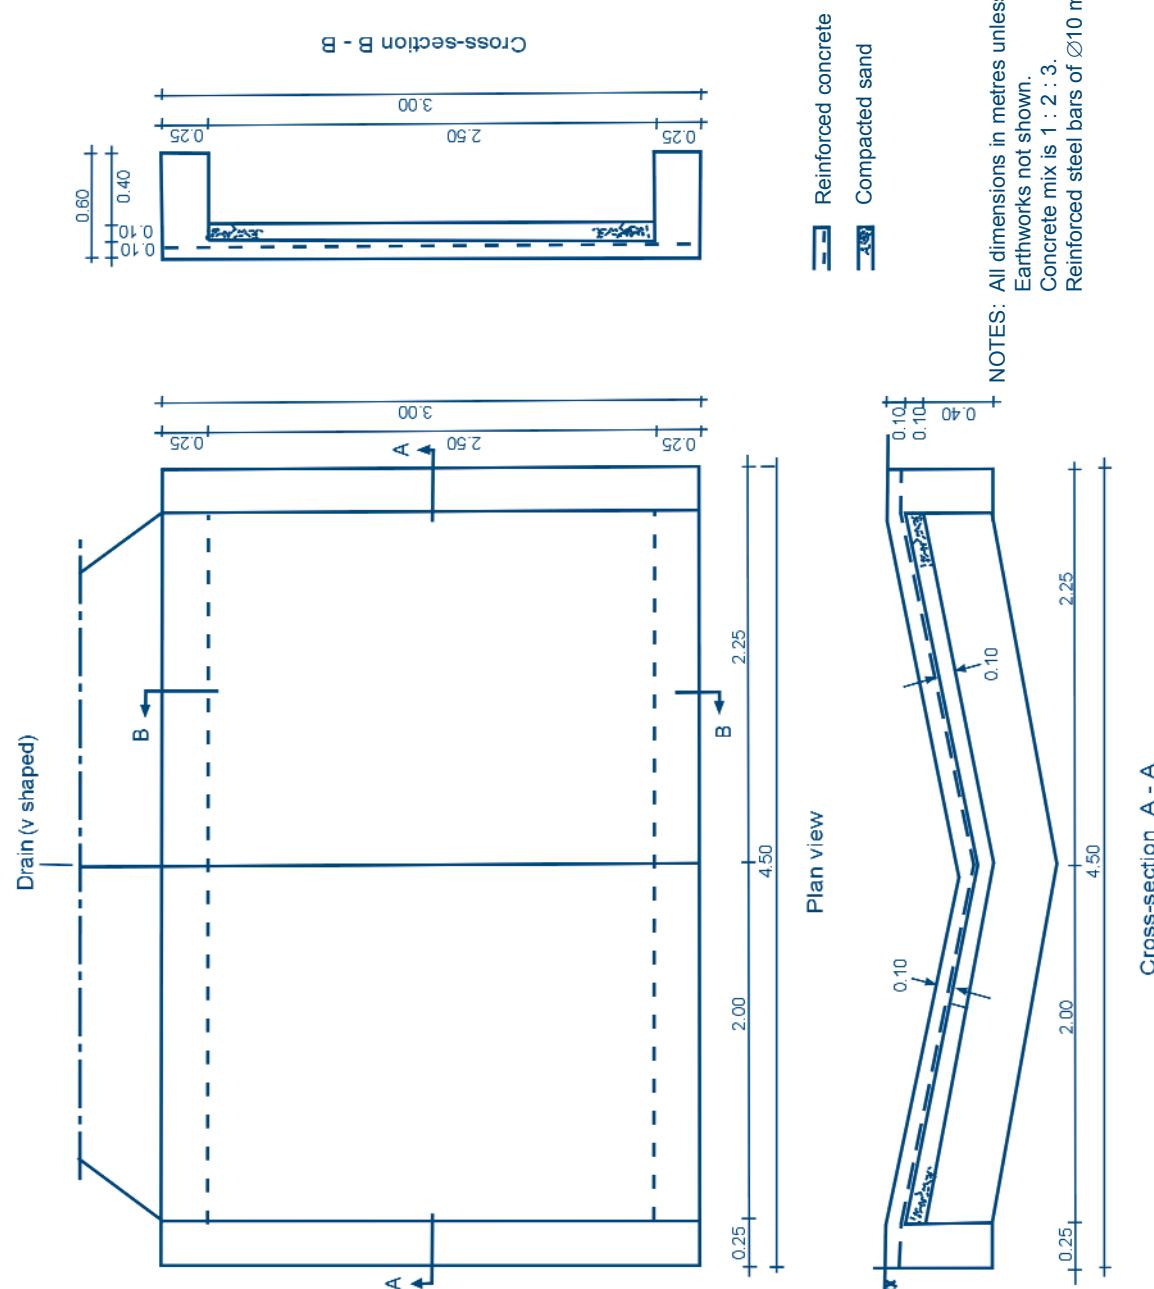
shows a typical design of a saddle bridge or drain-road crossing.
